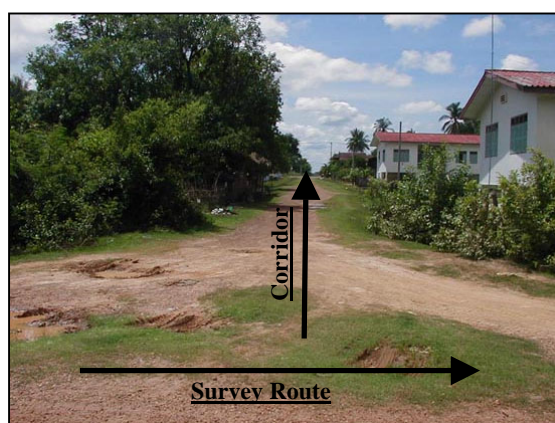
Access Road to Existing Route 14A (at 28.0km)
